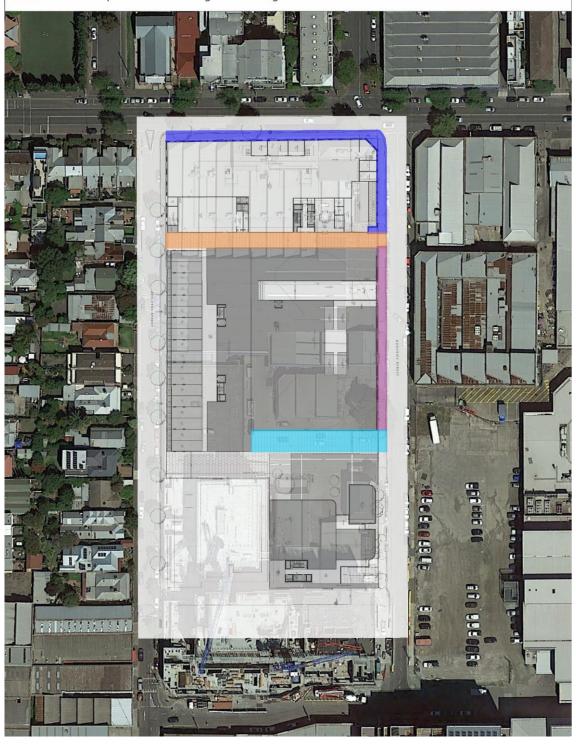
Treatment Scheme – Level 1 and Level 2 Awnings on Buildings A and B
